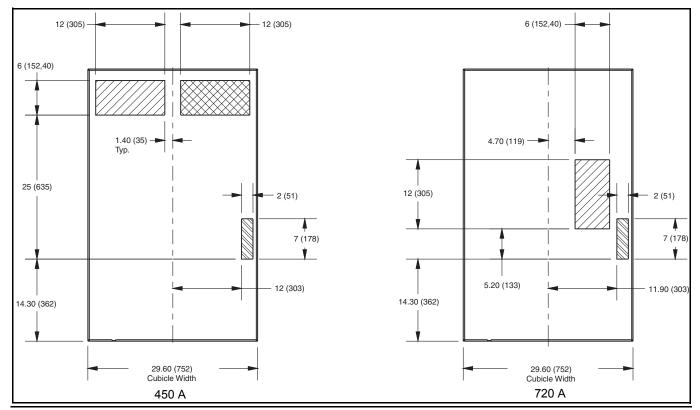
Type 3R 450 and 720 A Controllers, Plan View
